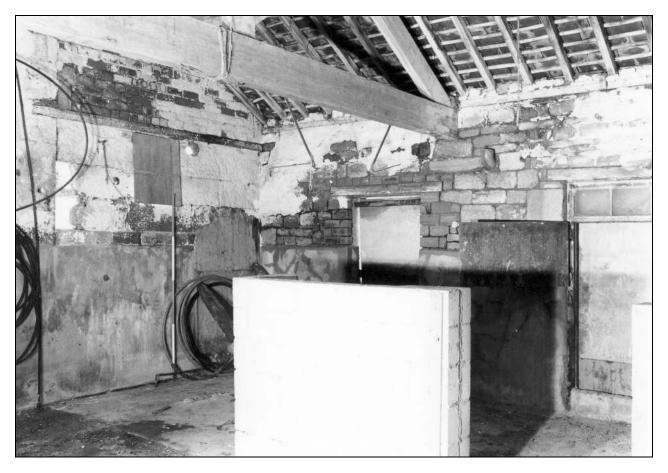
Interior of cow house, from the south-west (film 3, frame 6)
